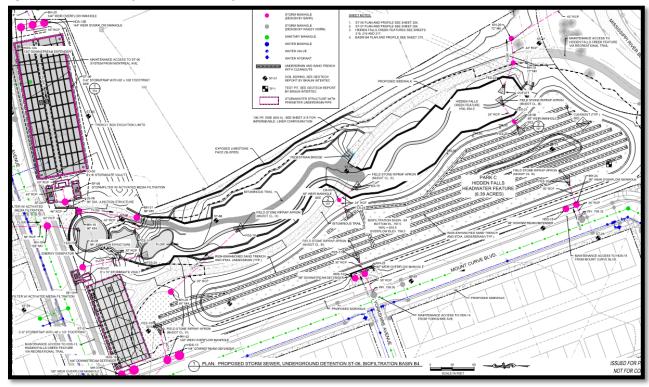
Preliminary Stormwater Layout for Hidden Falls Headwater Feature
